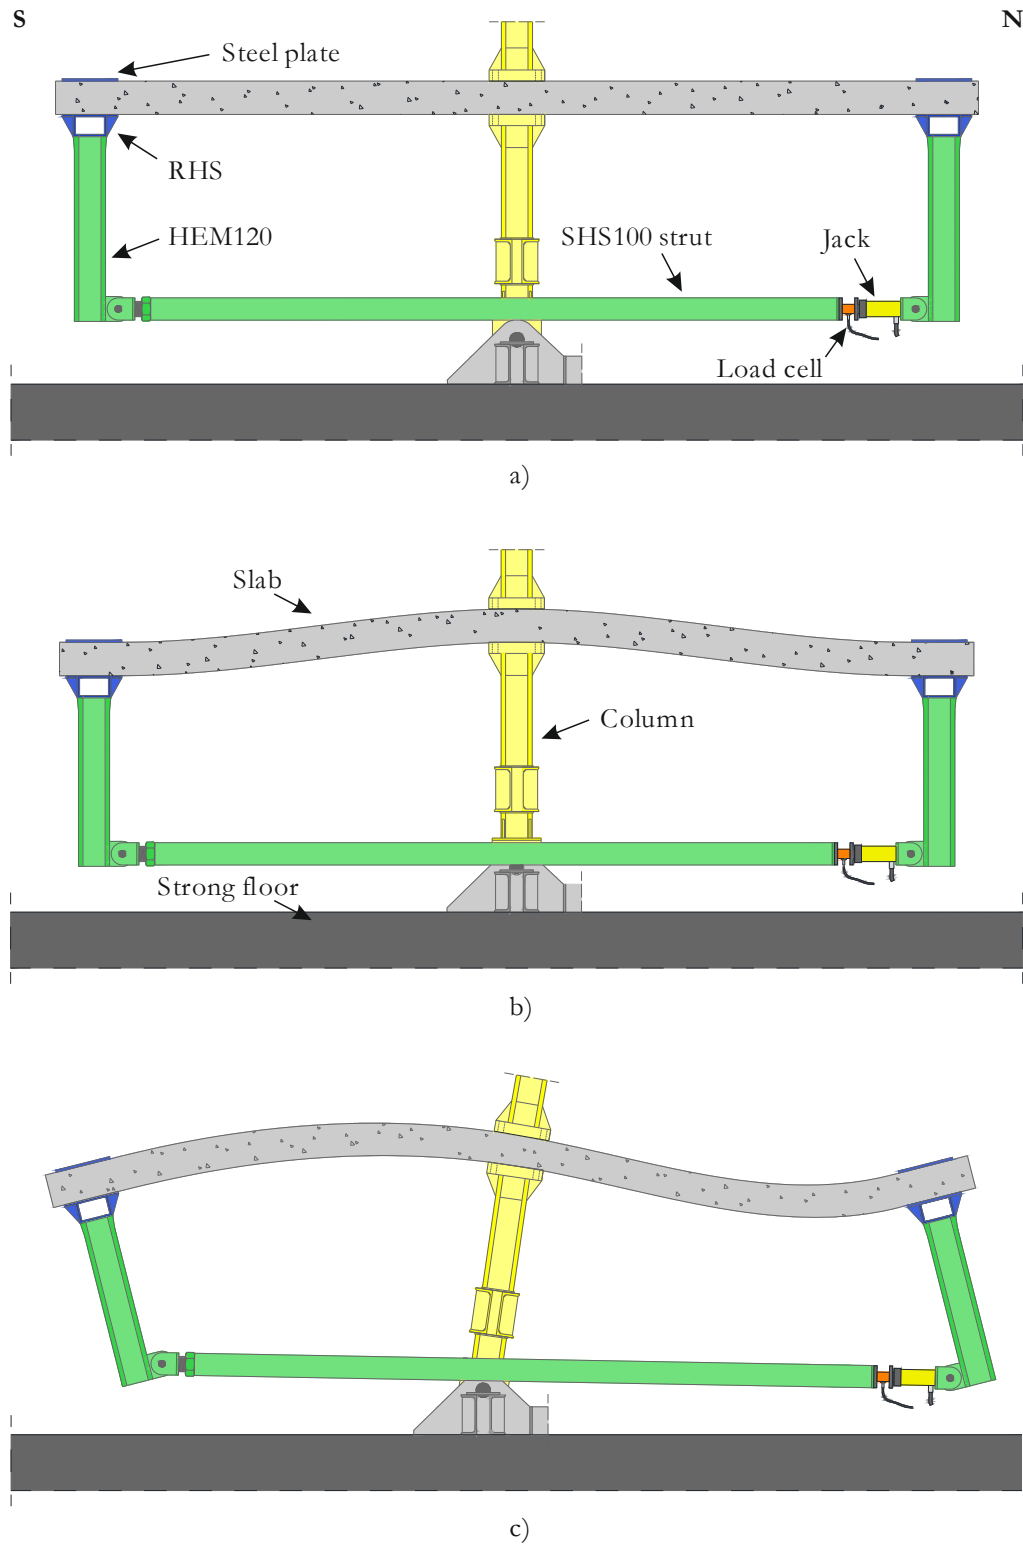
Scheme and detail of the rotation compatibilization system. a) Unloaded specimen; b) Vertically loaded specimen; c) Vertical and horizontally loaded specimen.
